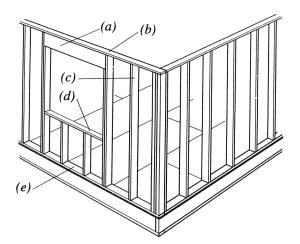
Timber frame wall (NBI Building Details A 523.251). (a) Lintel, (b) top rail, (c) stud, (d) nogging, (e) bottom rail.
